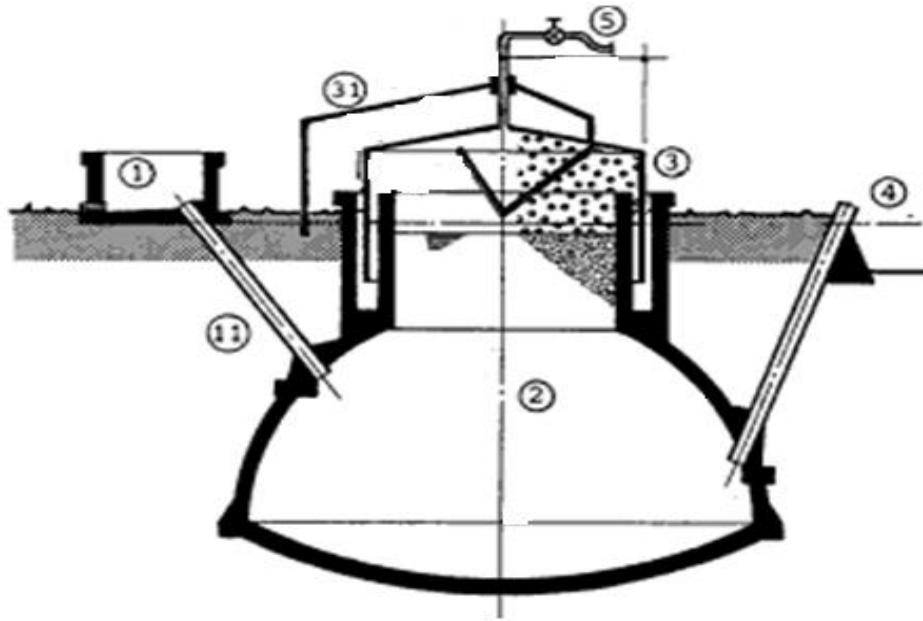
Floating drum plant 1.Mixing pit, 11.Fill pipe, 2.Digester, 3.Gasholder, 31. Guide frame, 4. Slurry store, 5.Gas pipe (Source: Madyan Adel, 2004).
